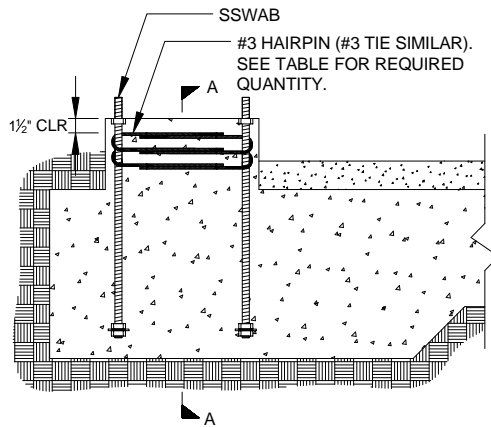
STEEL STRONG-WALL ANCHORAGE DETAILS (Continued) (3/SSW1)
